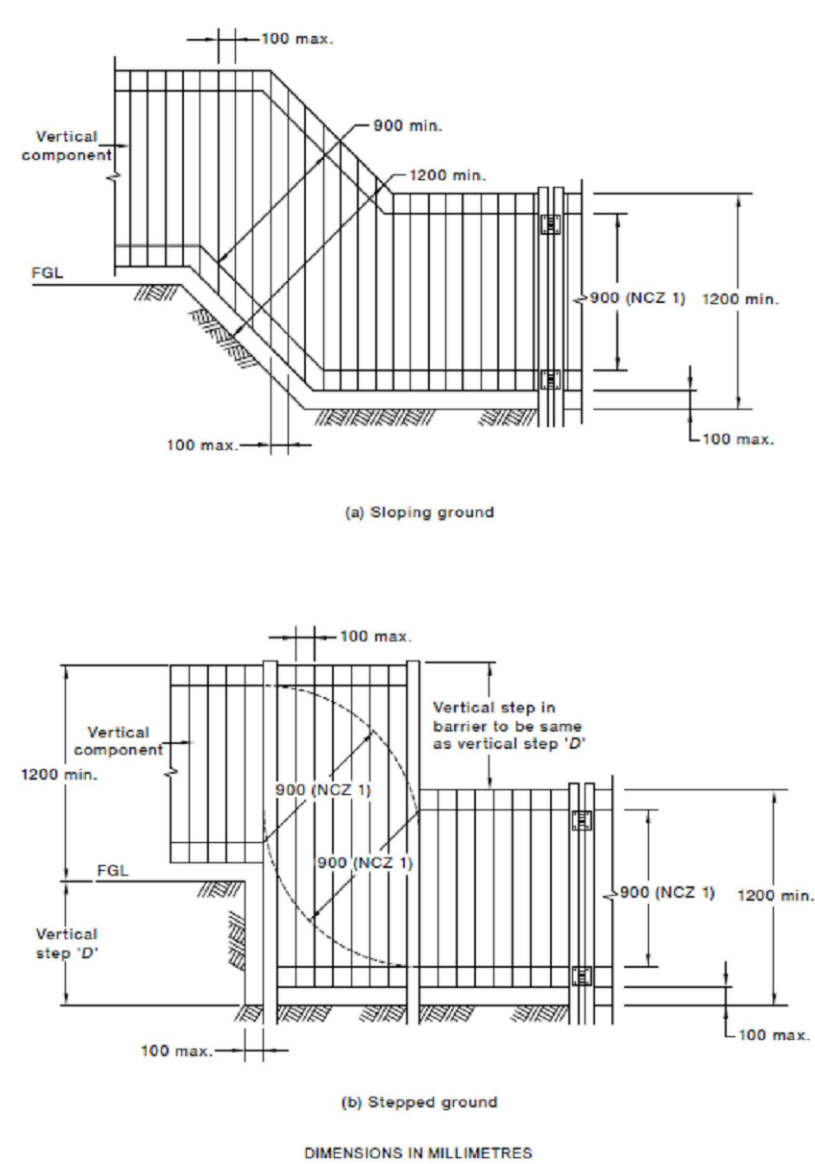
(in part) PERPENDICULAR BARRIER DIMENSIONS
